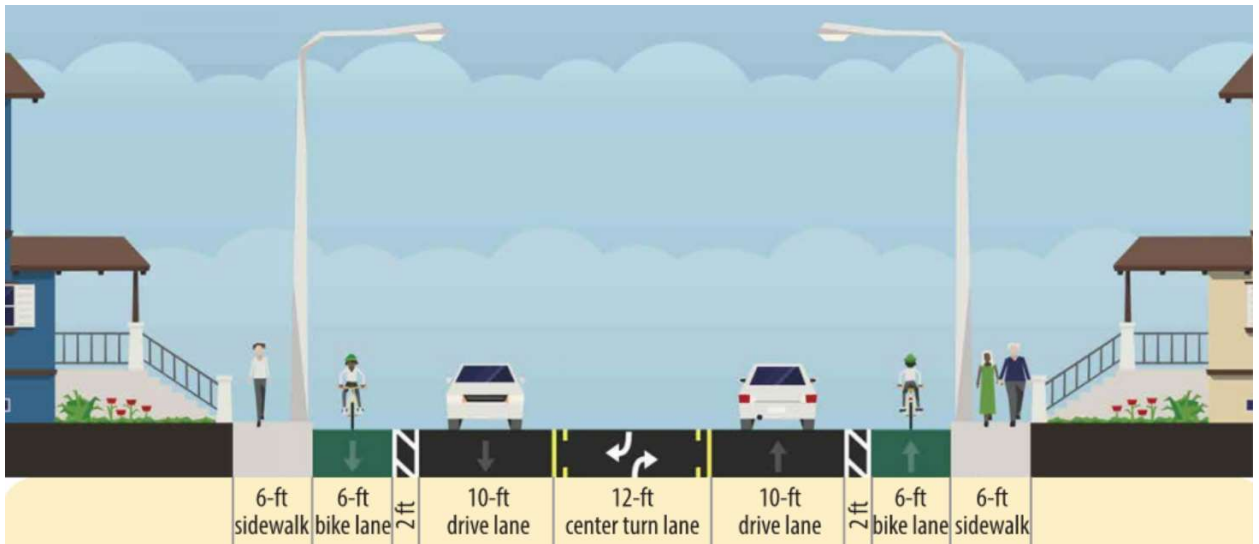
Three Lane with Buffered Bikeway Typical Section
